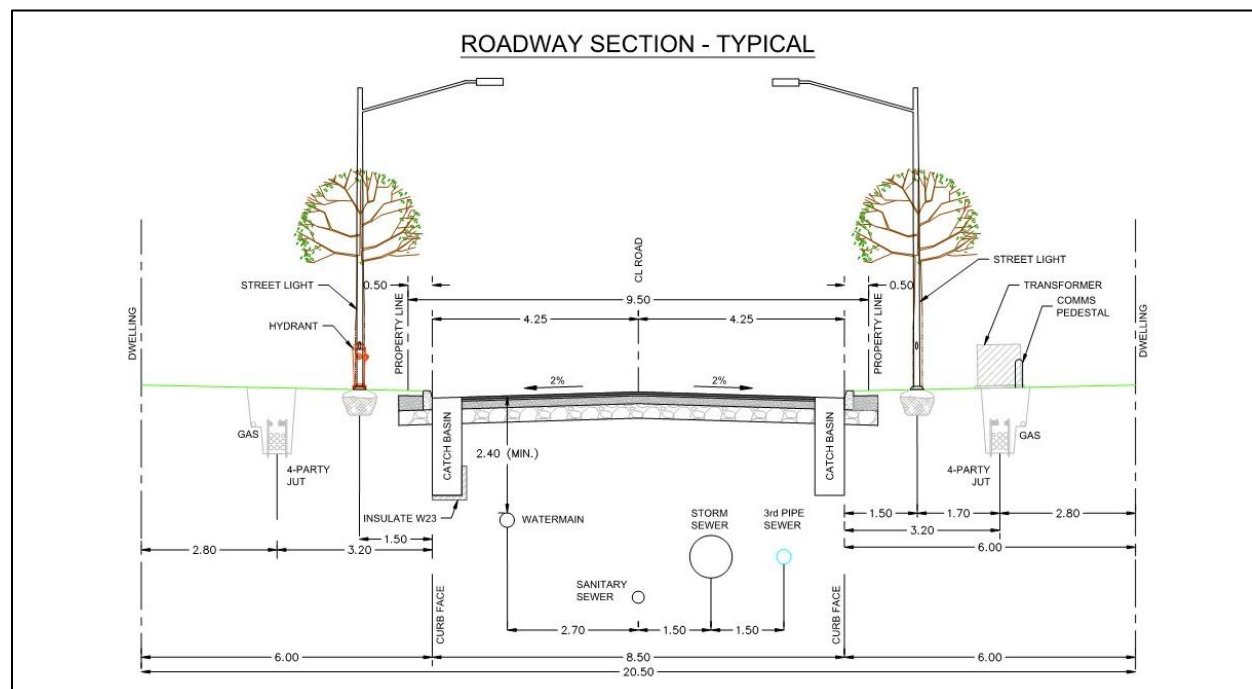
Excerpt from the Roadway Section – Typical cross-section prepared by Novatech dated August 18, 2025.
